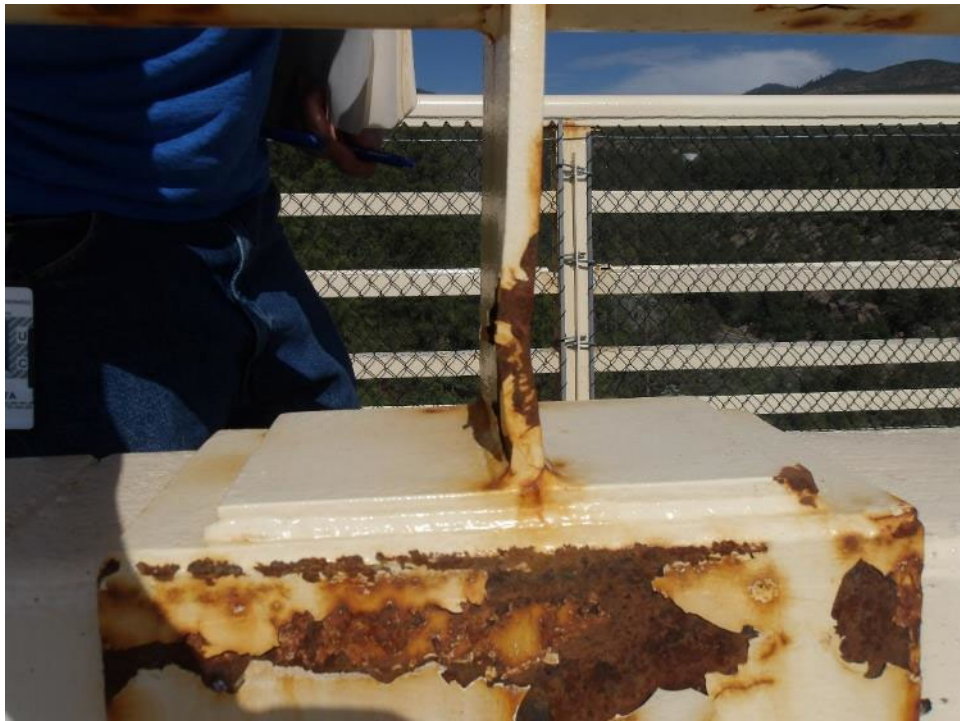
Paint failure and impact damage at the western guardrail connection (TYP).
